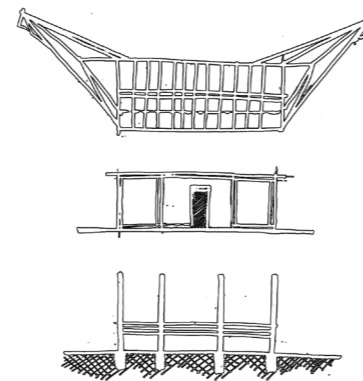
a. The bamboo roof structure b. Structure of the living spaces -bamboo c. Elevated foundation structure
